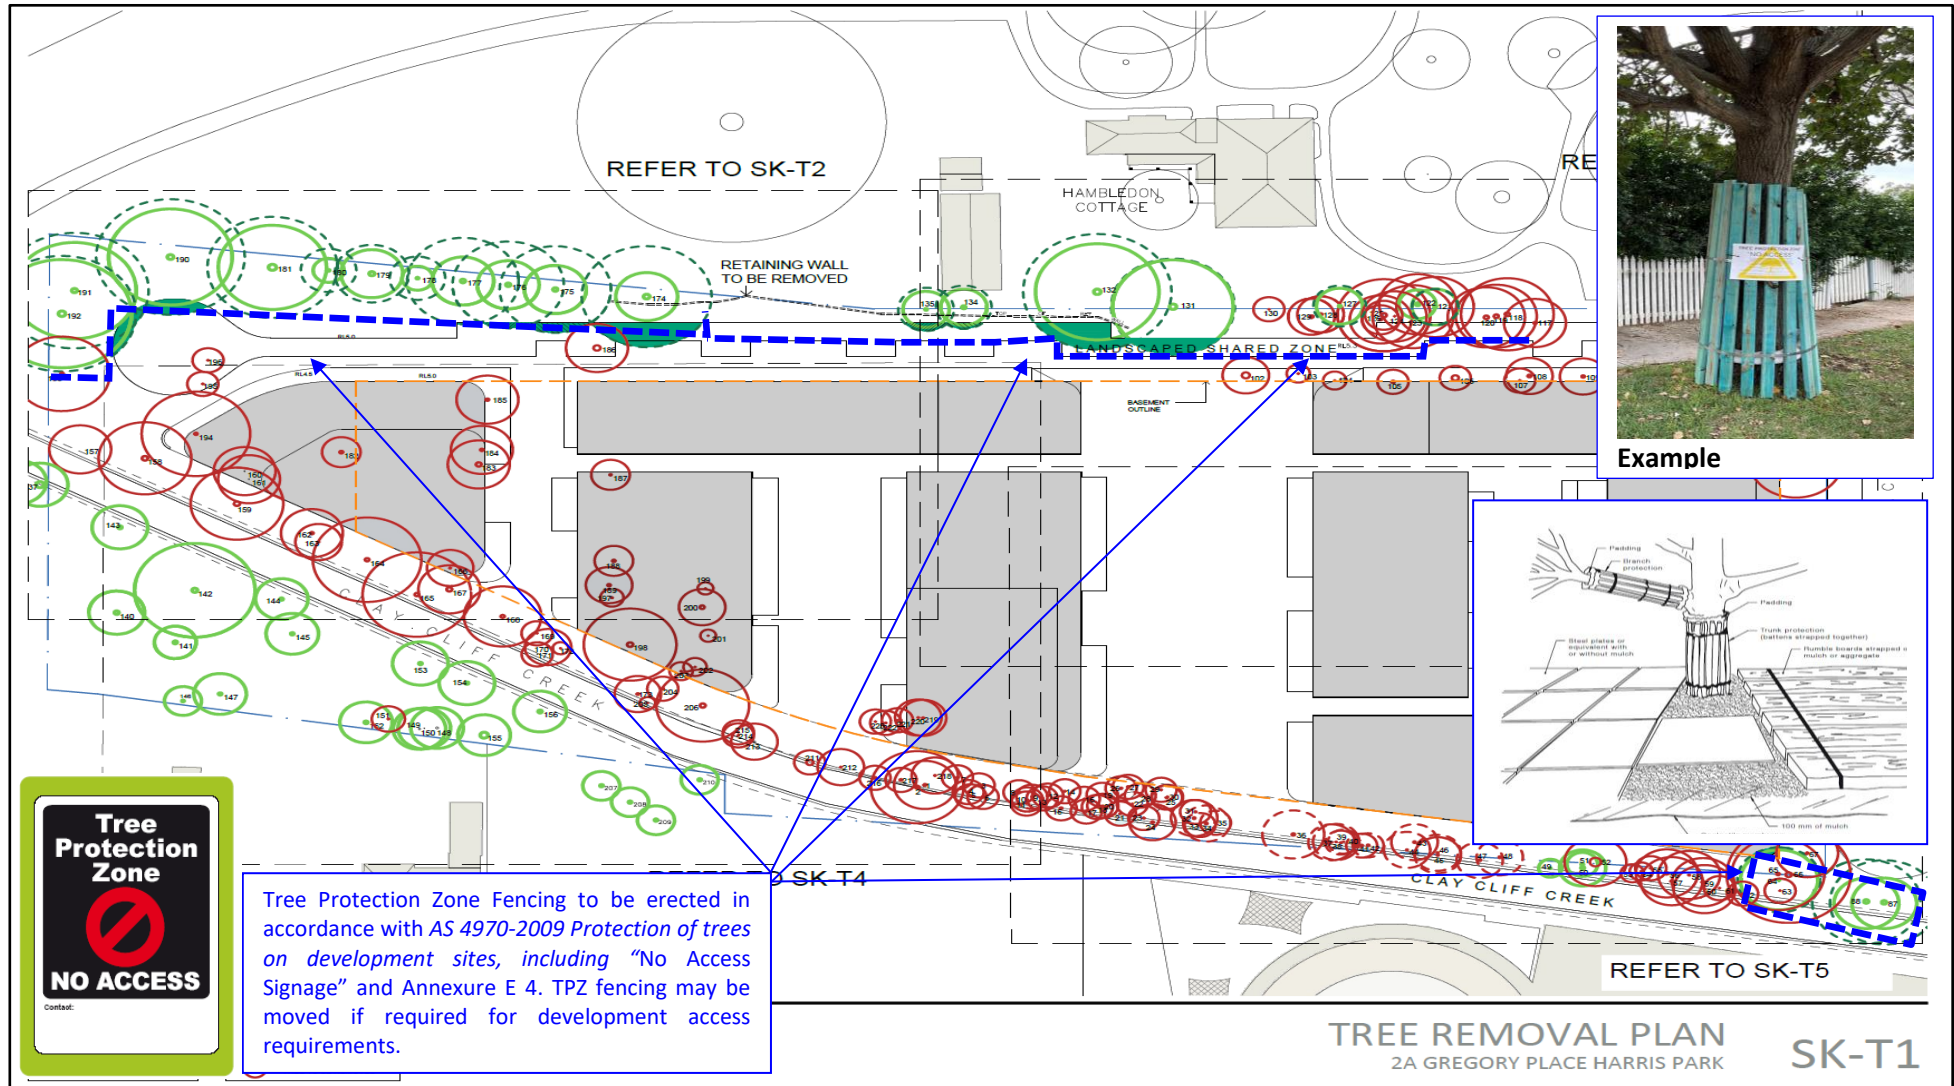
Shows Site and adjoining trees to be protected and managed based on overview plan tabled.
